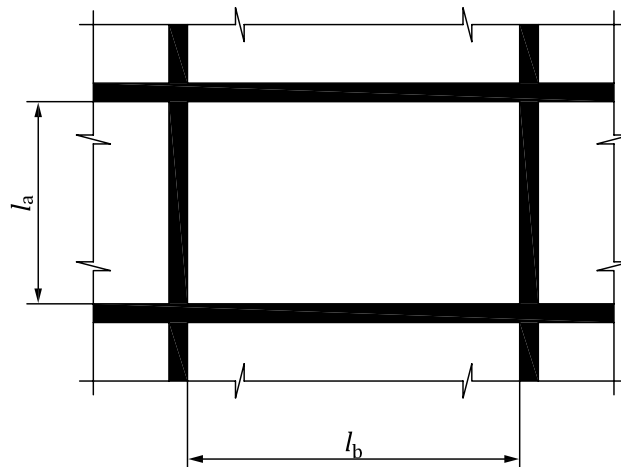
Central panel of two-way slabs supported on girders, beams or structural concrete walls
